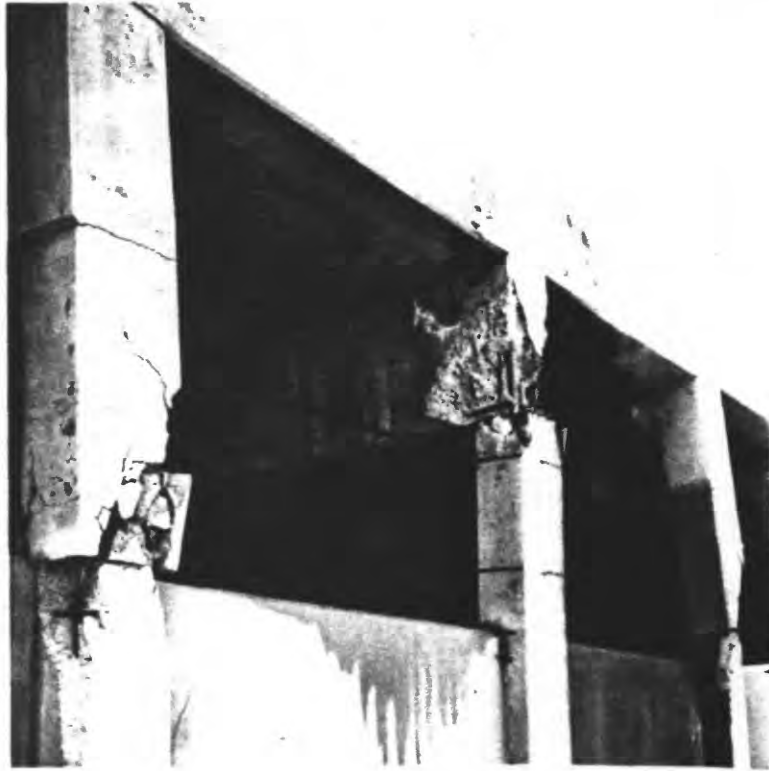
Beam column joints unconfined. Bottom longitudinal bar of the girder cut.
